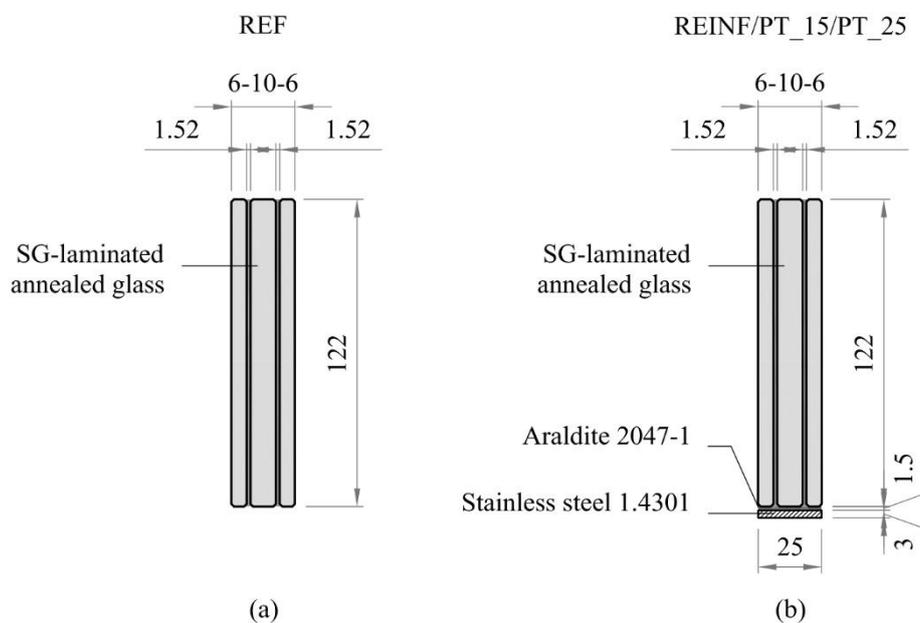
Cross-sections of beam specimens; (a) reference glass beam; (b) reinforced/post-tensioned glass beam; all dimensions are given in [mm].
